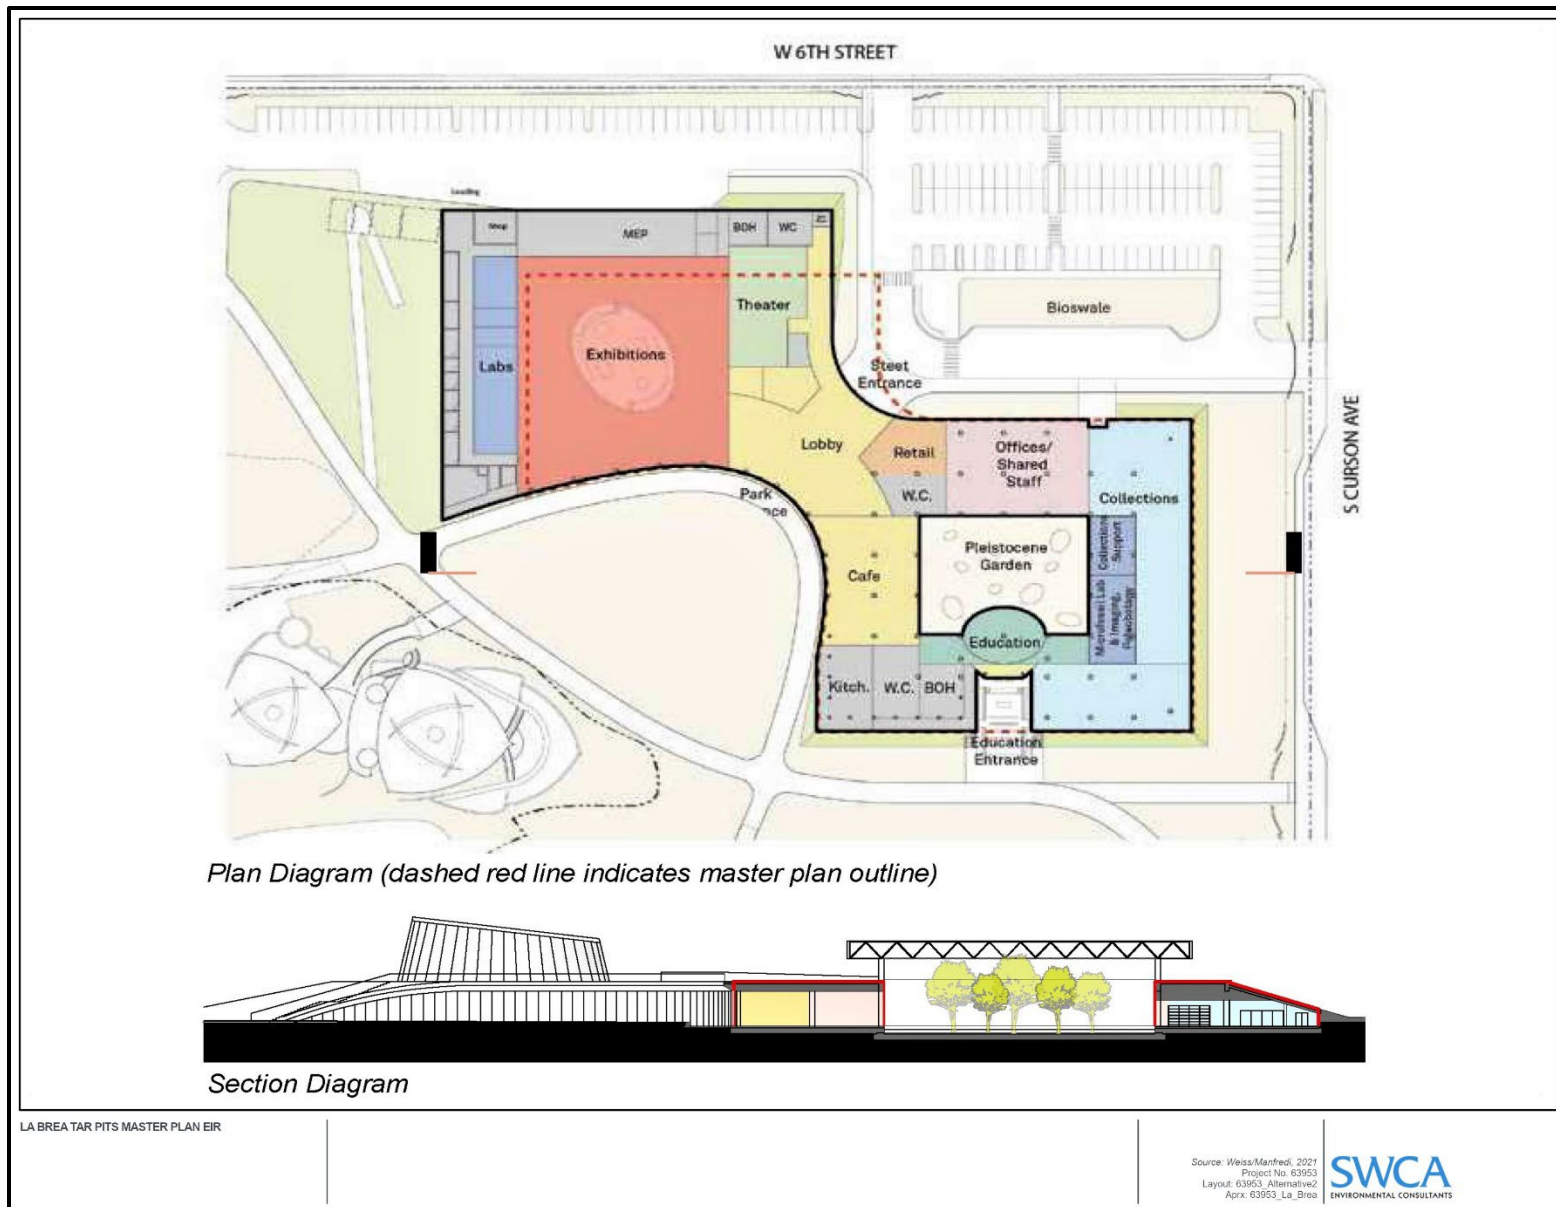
Alternative 2: Museum plan and section diagrams.
